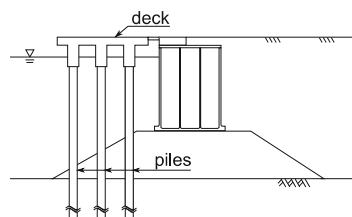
Construction of a new pier to enlarge the front-water depth of the caisson-type quay wall.
